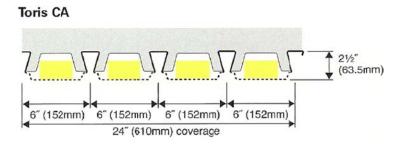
Lond Span (EPIC Metals) Deck on Steel Beams
